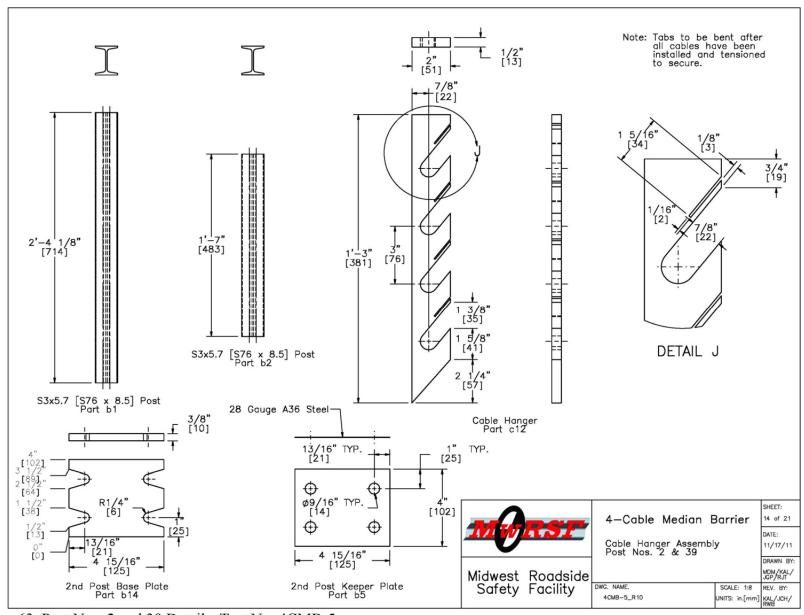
Post Nos. 2 and 39 Details, Test No. 4CMB-5
